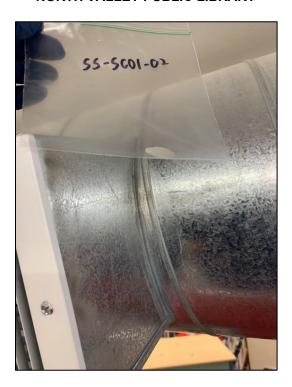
SC01: Clear silicone around heating / cooling duct in main library room
